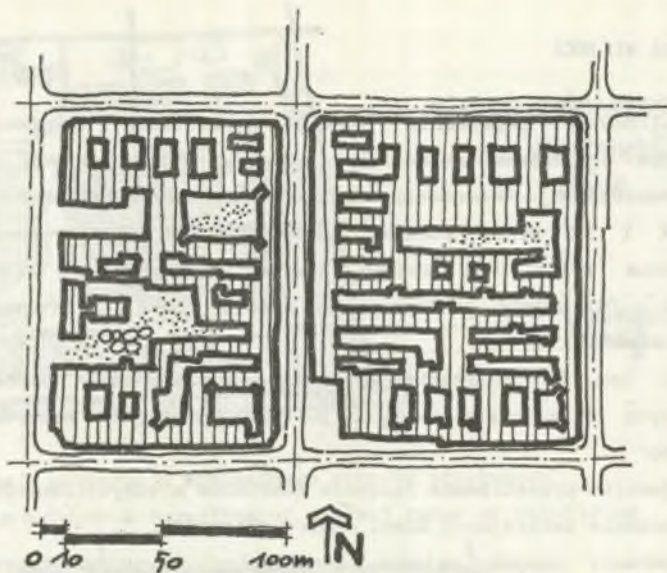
A schematic plan of development by M.Cykalewicz (b- covered trade and service center, z- green, interior excluded from penetration, d- newly designed buildings, p- pedestrian traffic on the ground-floor level, g-many level parking space)
